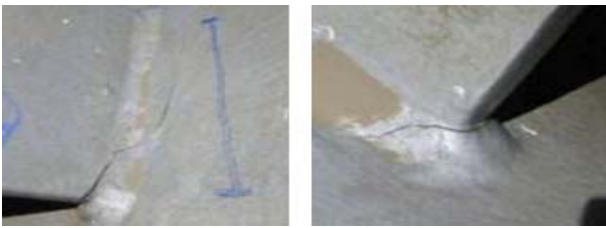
Fatigue Crack of Web Stiffener
